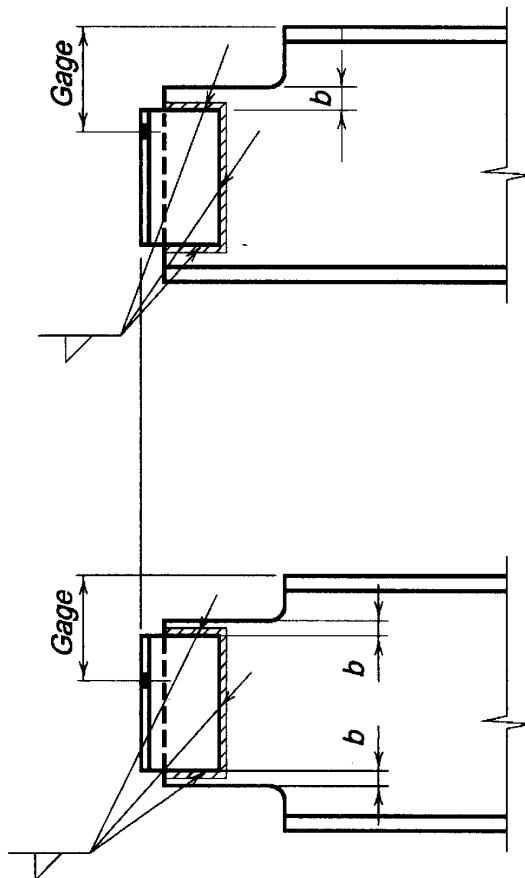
Illustration of shelf dimensions for fillet welding.
